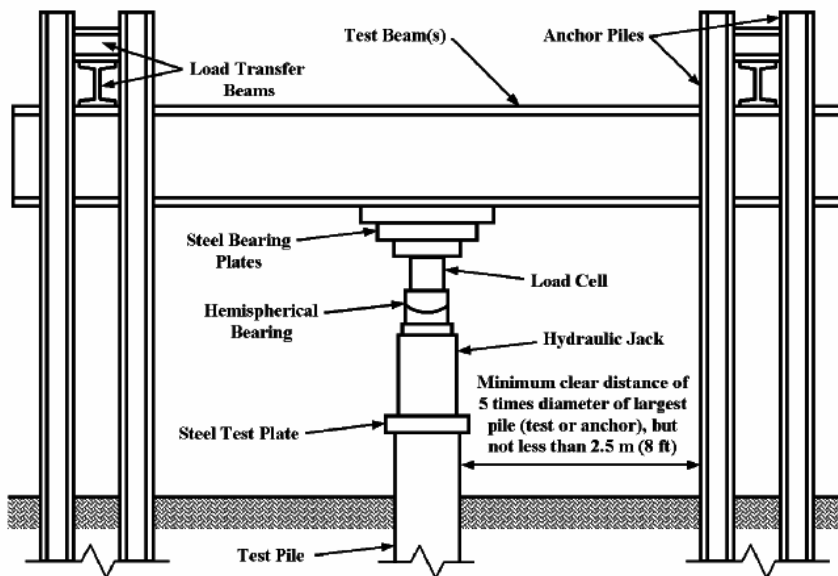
Schematic of Hydraulic Jack acting against anchored reaction frame (ASTM D-1143).
